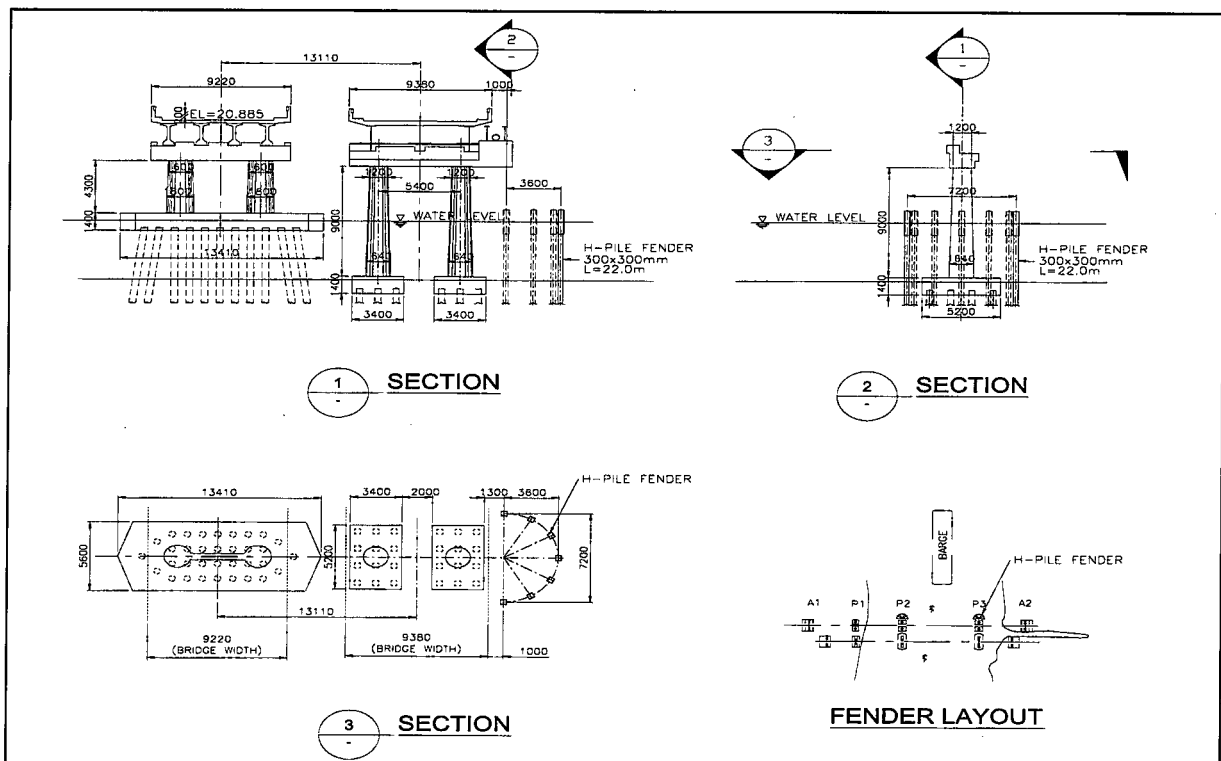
Layout of Vessel Collision Fenders
